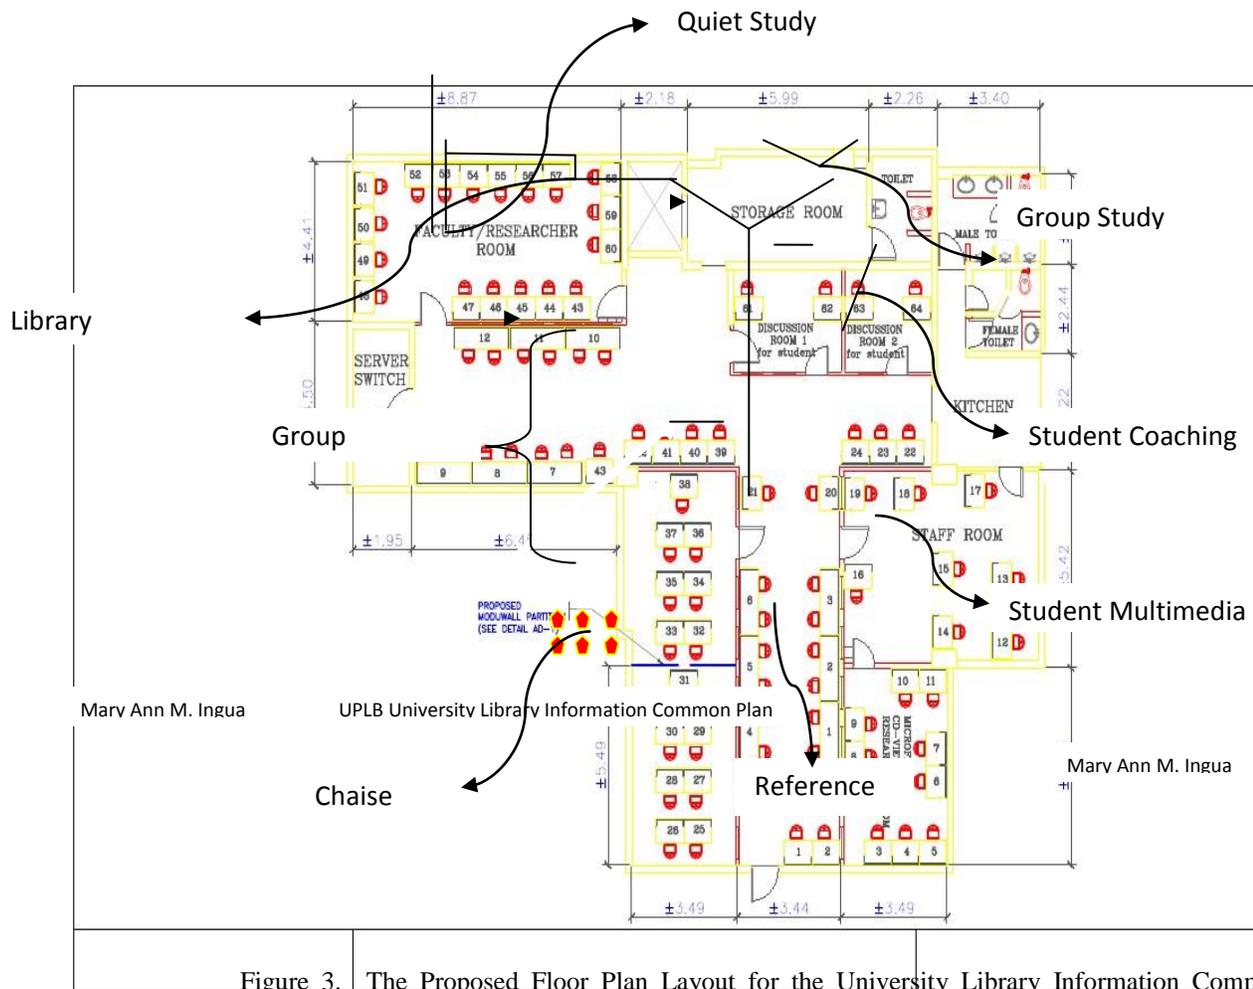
The Proposed Floor Plan Layout for the University Library Information Common (ULiCOM)
